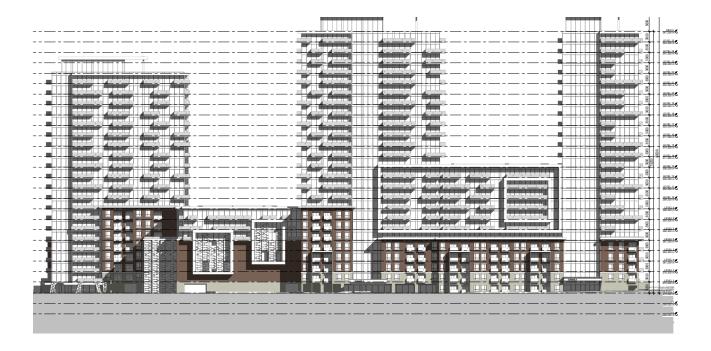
South Elevation, Building 1, prepared by SRM Architects.
